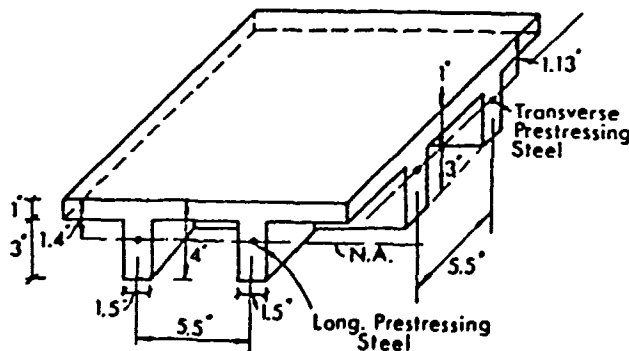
Cross-Section Geometries of Waffle (Orthotropic) Slab Models
